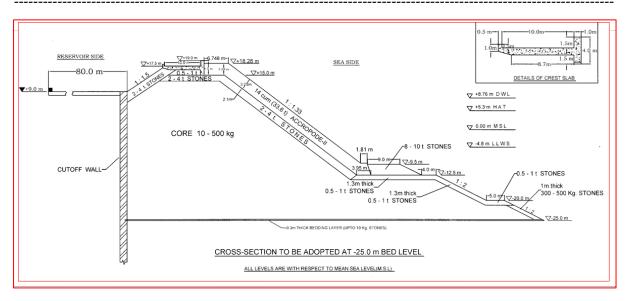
Cross-section of sea dyke with Accropode-II armour units at -25 m bed level for the proposed dam of Kalpasar Project, Gujarat
